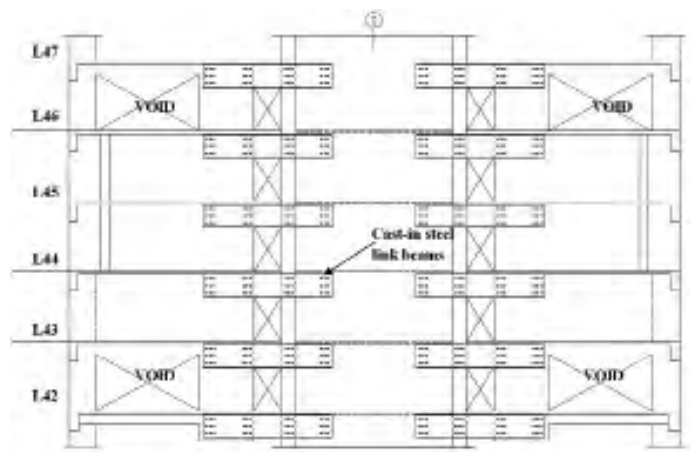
Core-Outrigger Lateral System Elevation at Level 42-47 (TTW)
